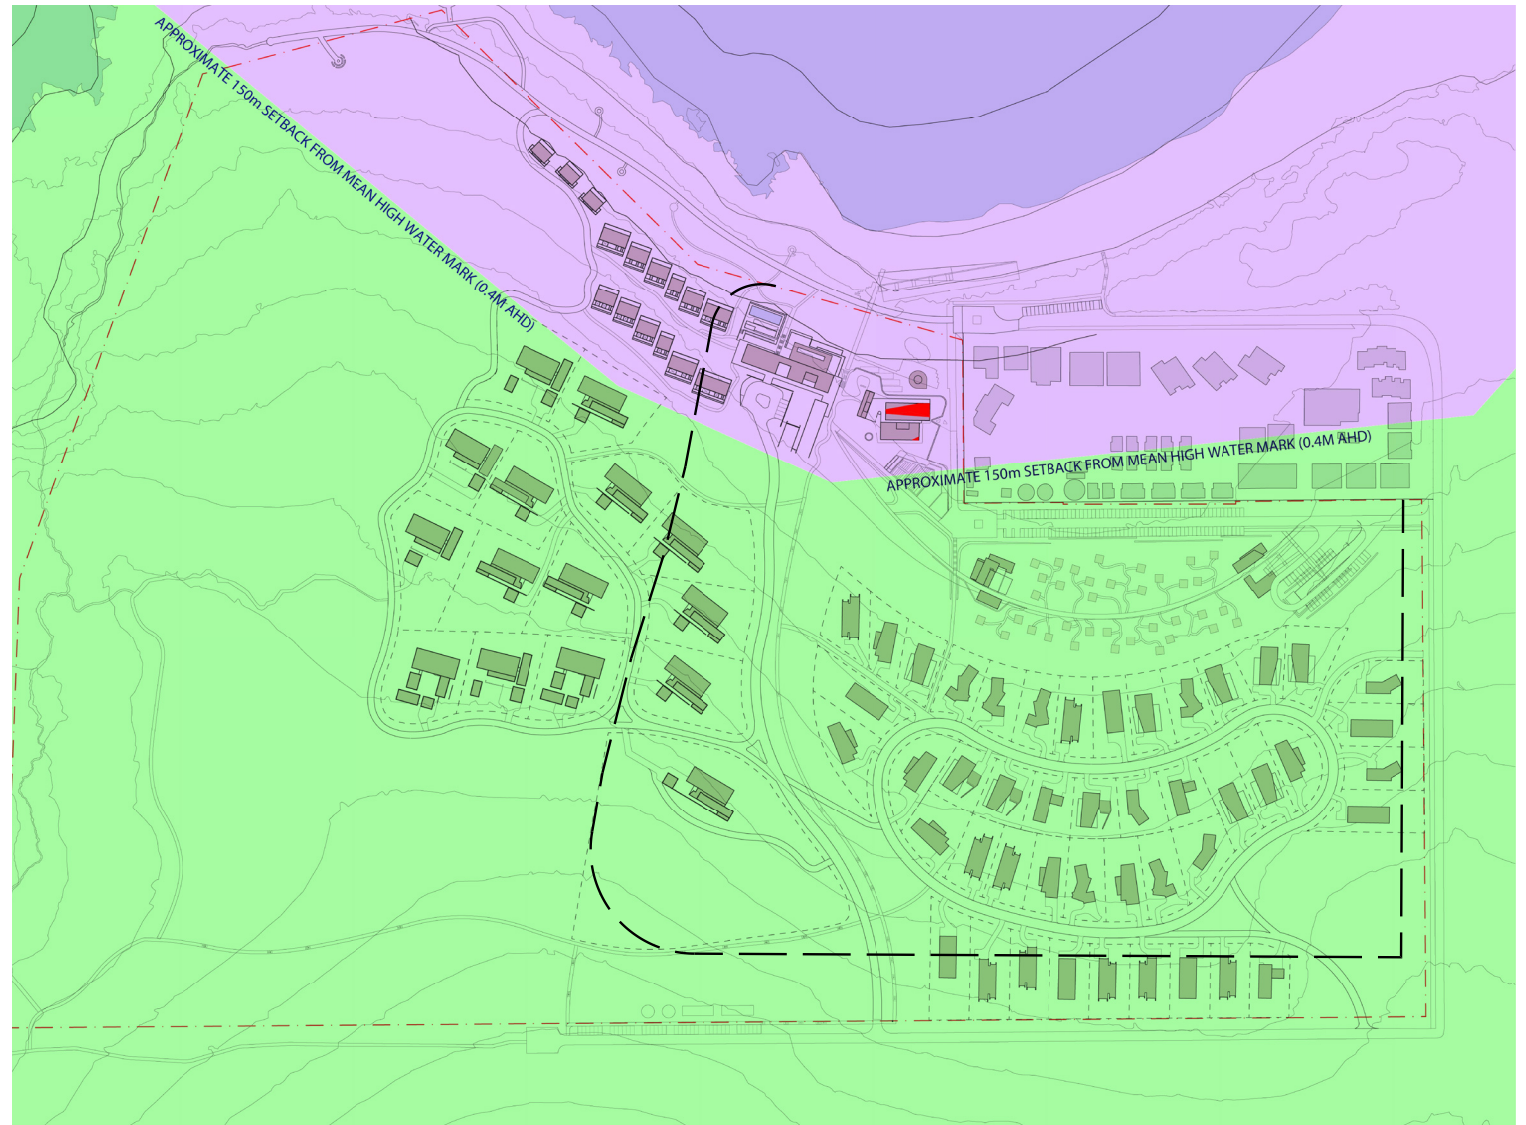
Proposed building heights outside of approved Building Height Plan (LPS Clause 4.8.3)
